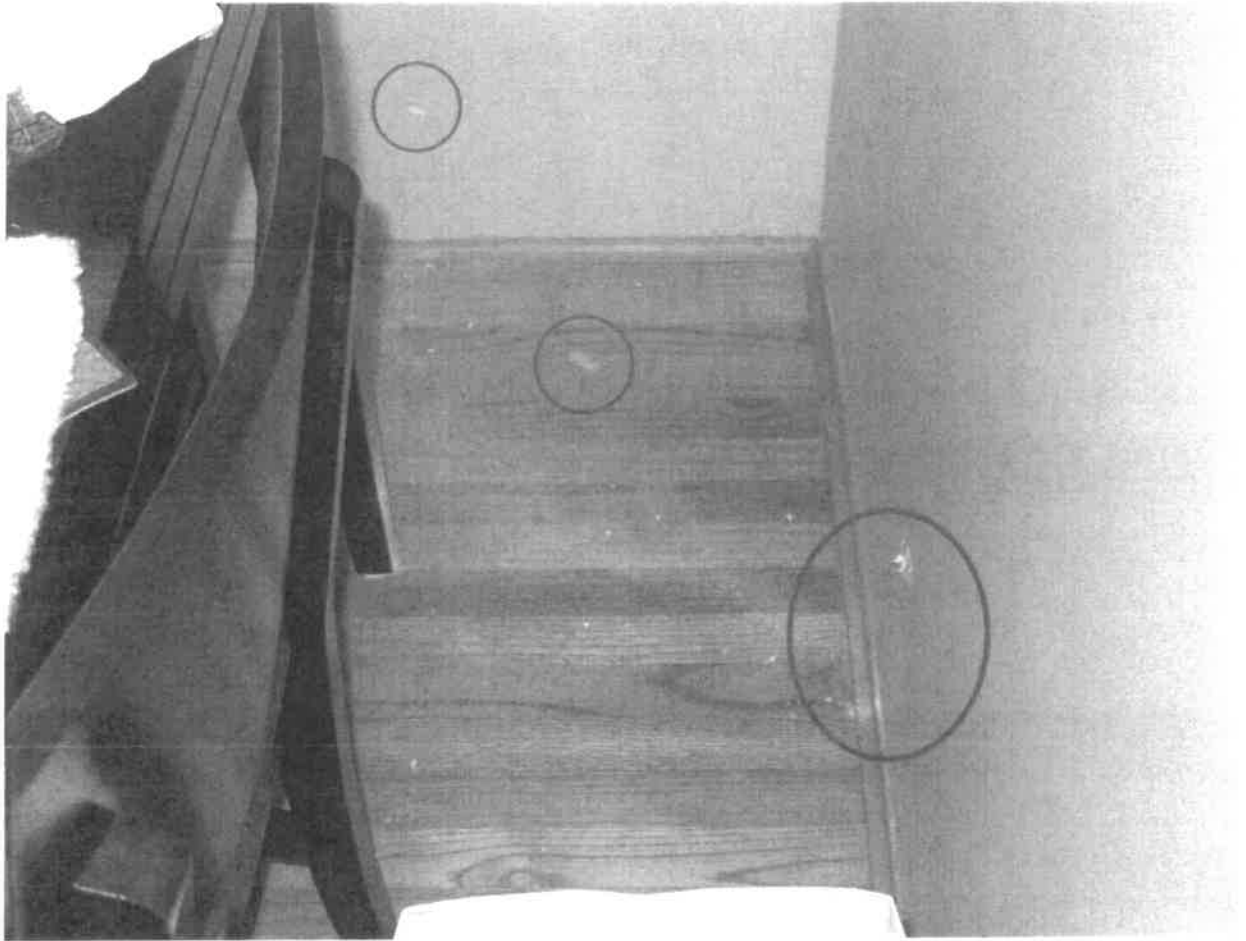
IMG_2222.jpg: Dining room floor and walls
